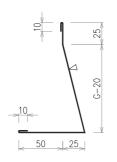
Ob-44 flashing "Inner skylight flashing"
